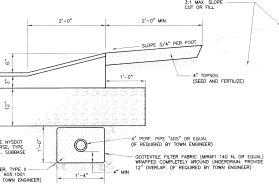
DETAIL OF INTEGRAL GUTTER SECTION (ASPHALT BERM)
